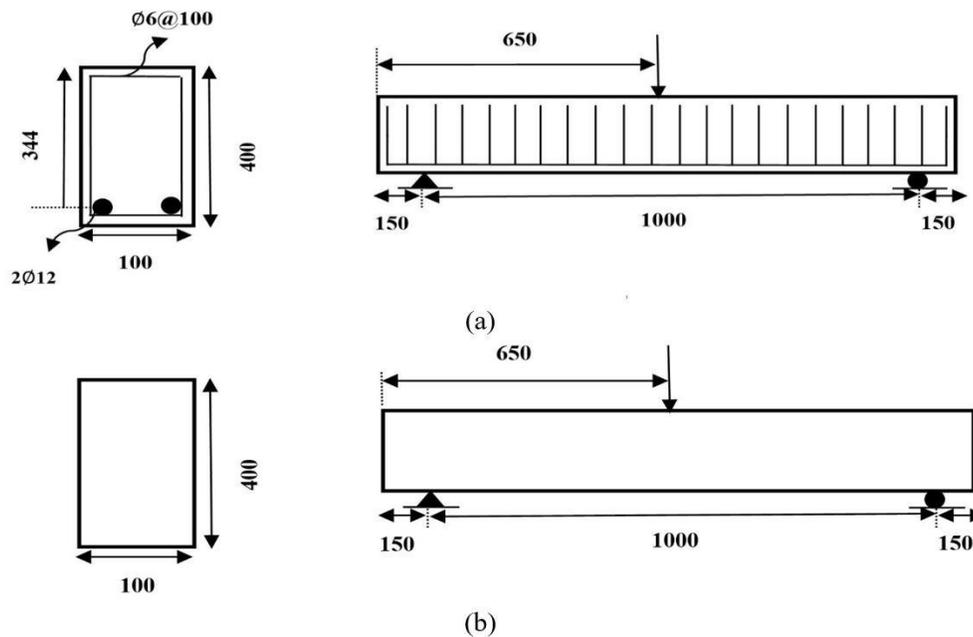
Concrete beams, a: Reinforced beams, b: Unreinforced beams (all dimensions are in mm)
